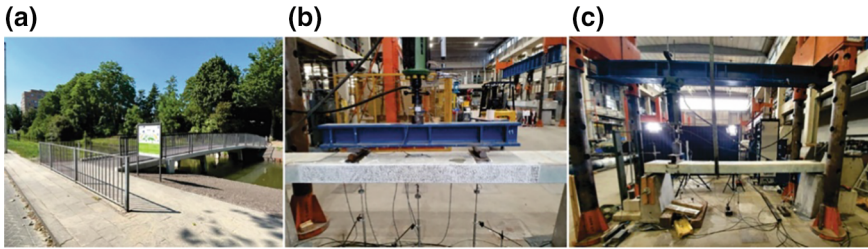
a steel reinforced precast pedestrian bridge, b four-point bending test of reinforced beam element and c shear test of reinforced beam element [13]. Foto archive of Prof. Stijn Matthys
